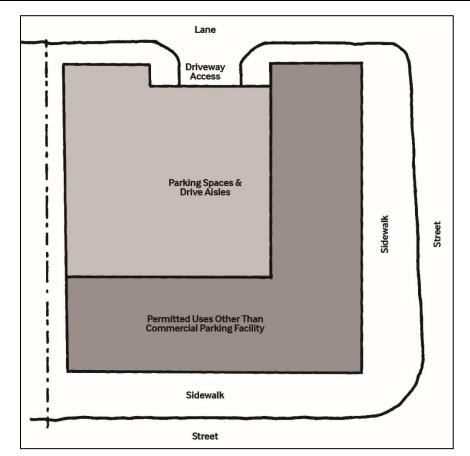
Location of Parking Spaces on the Ground Floor of a Building
